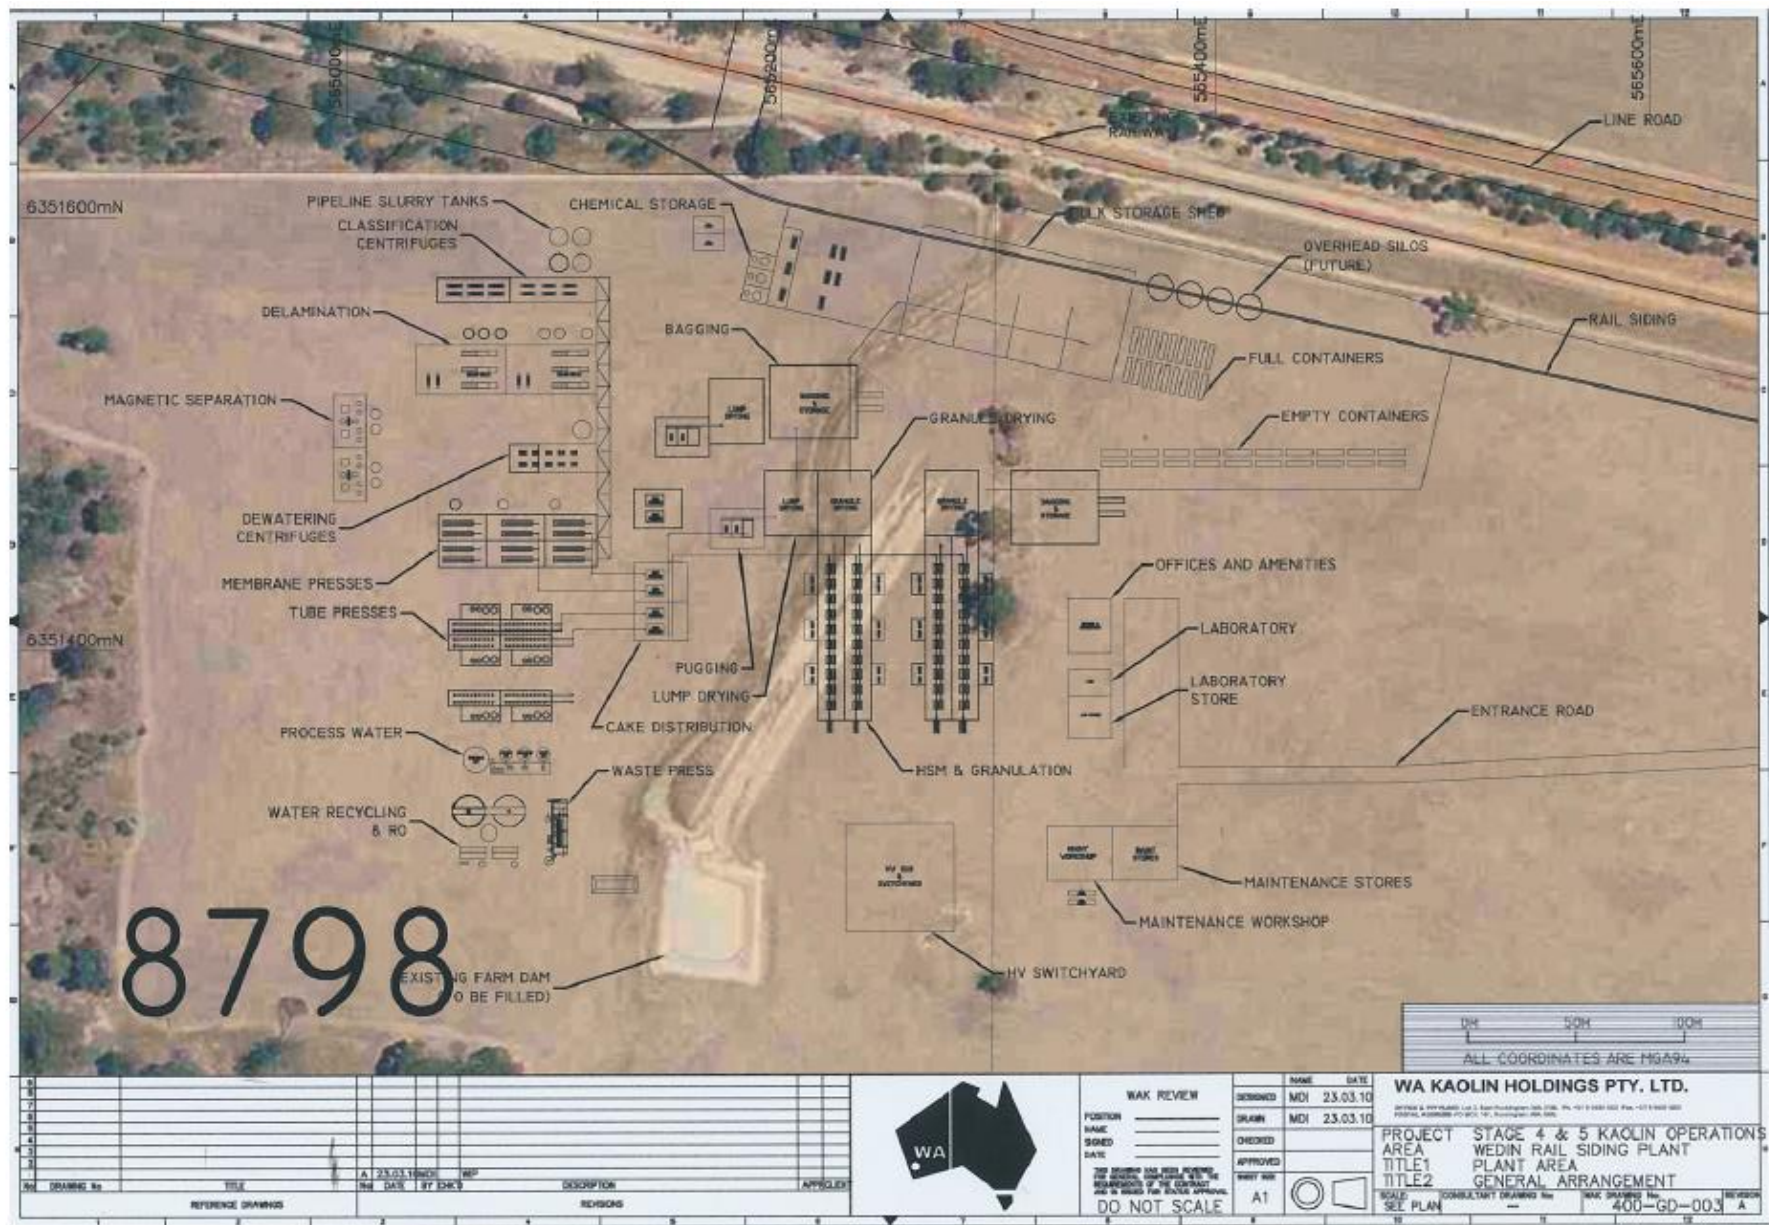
Detailed site plan for the Wedin Railway Siding Processing Plan.
